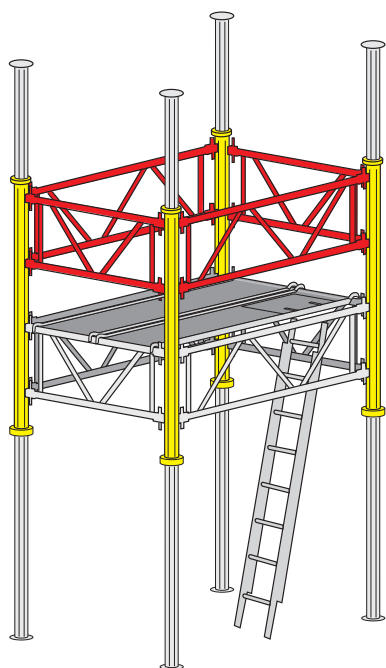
Fully decked and guardrailed working platform to form a scaffolders' safe zone with safe access and egress, used for the erection, alteration and dismantling of a formwork system.
